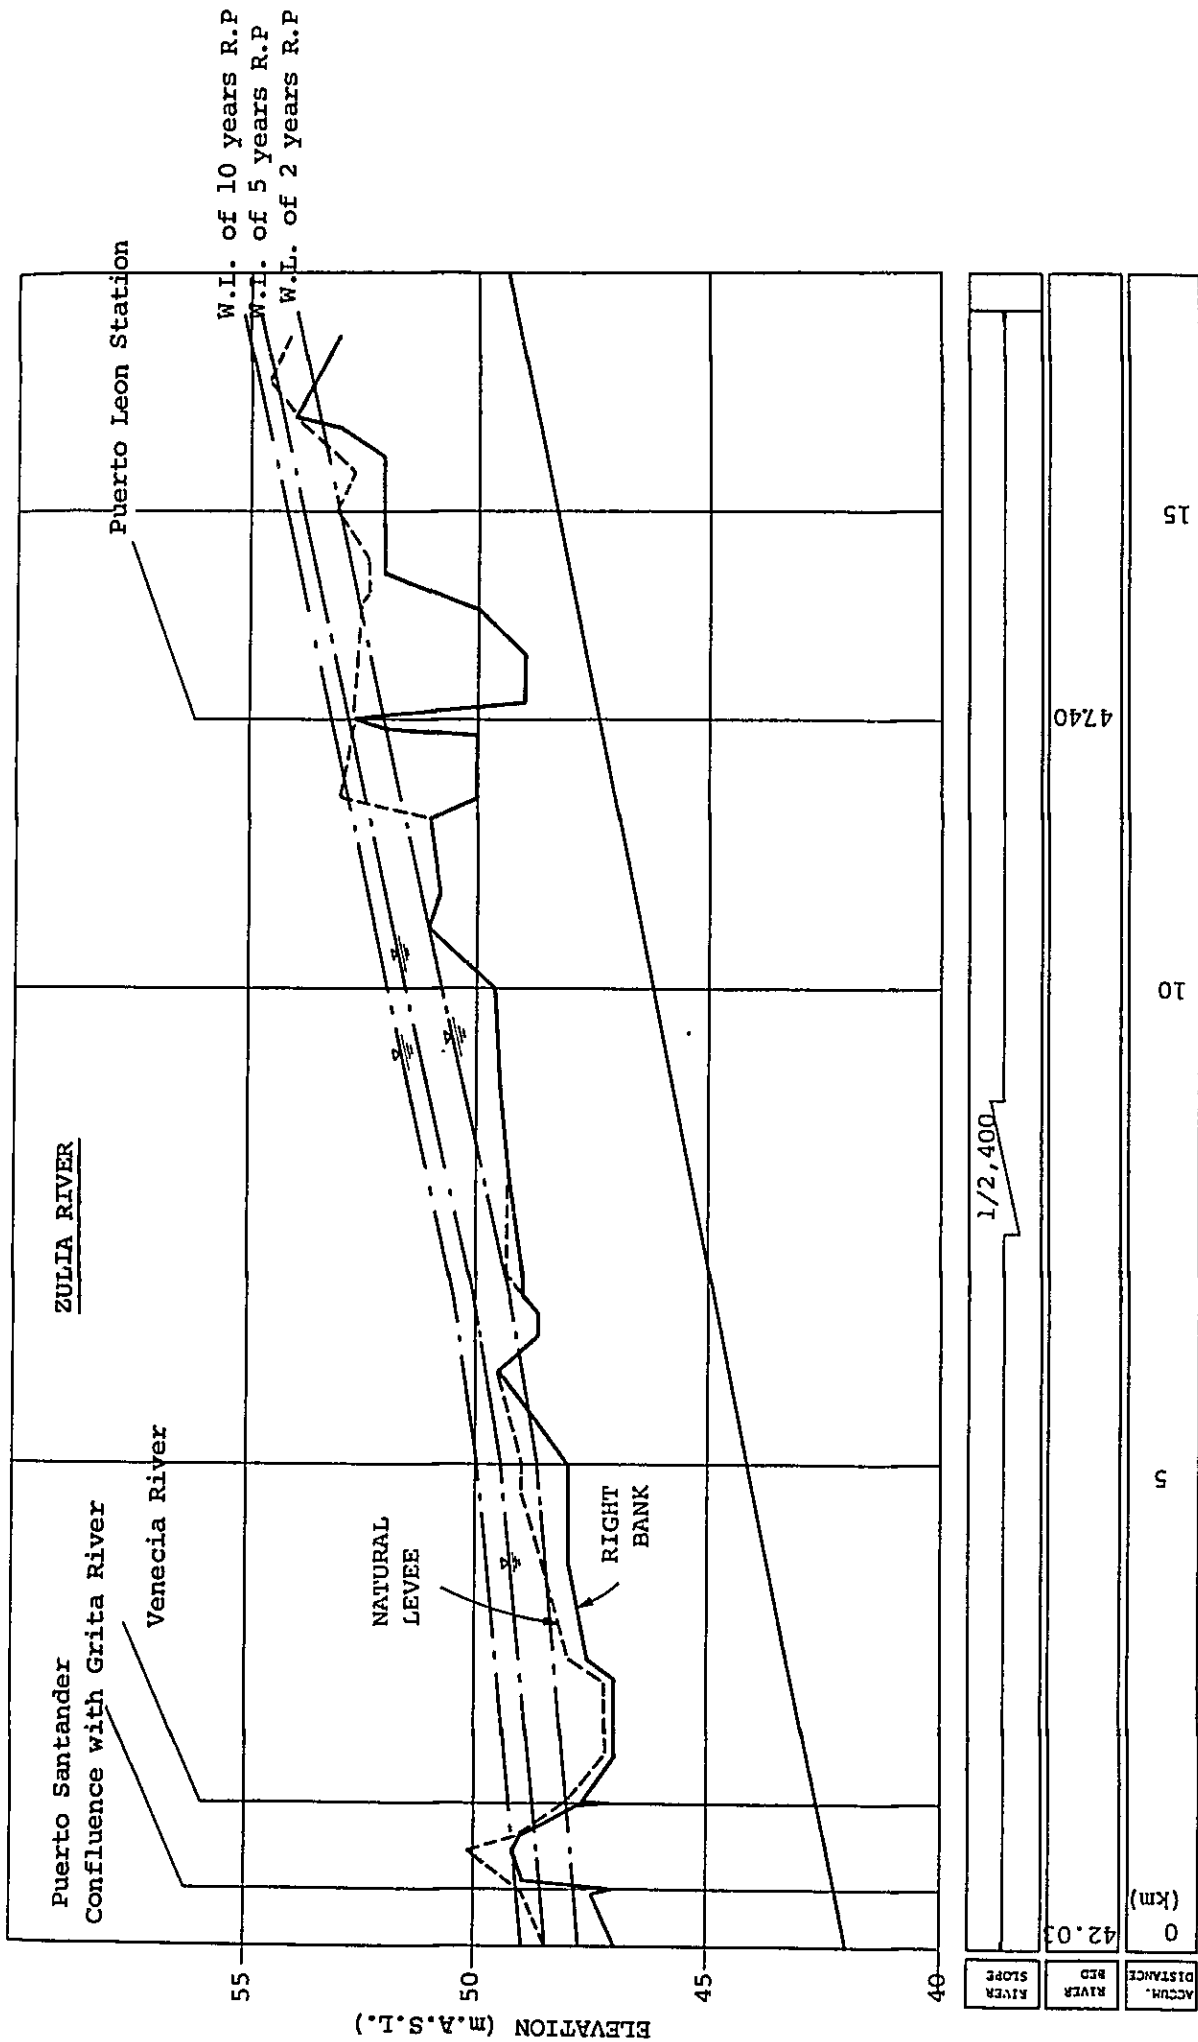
Longitudinal Cross Section of the Zulia River
